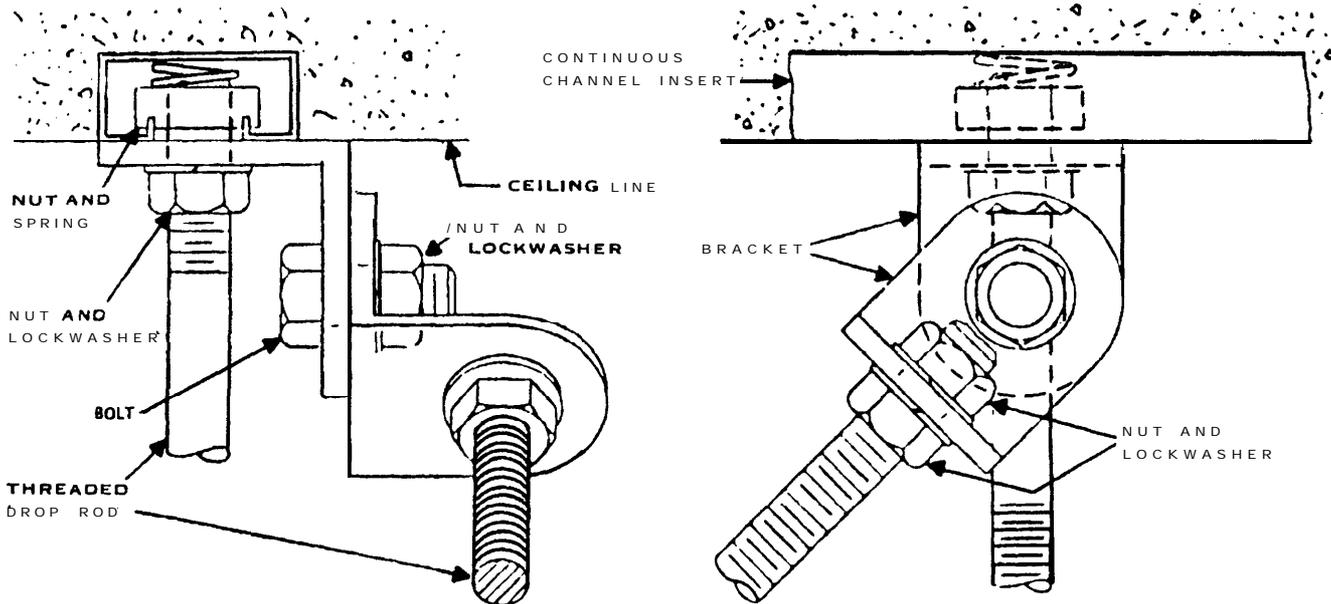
Typical Truss Assembly Single-Channel, Upper-Junction Fastening Method.
